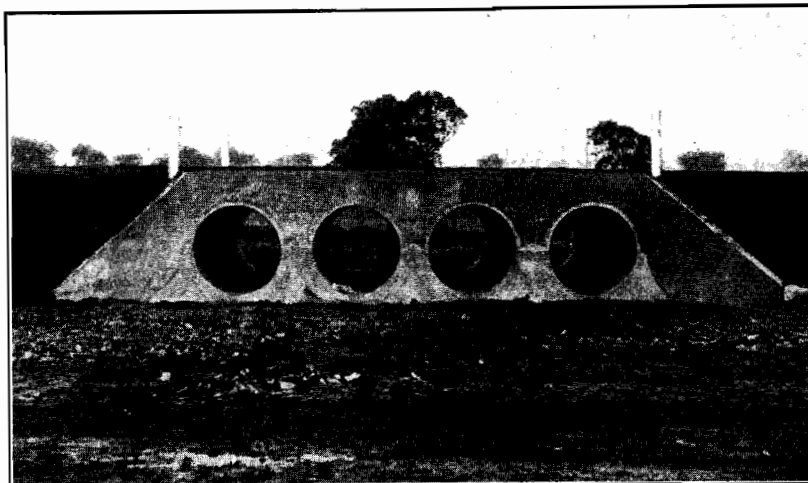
Quadruple pipe culvert erected on the Upper Goulburn Road in the Shire of Alexandra.
